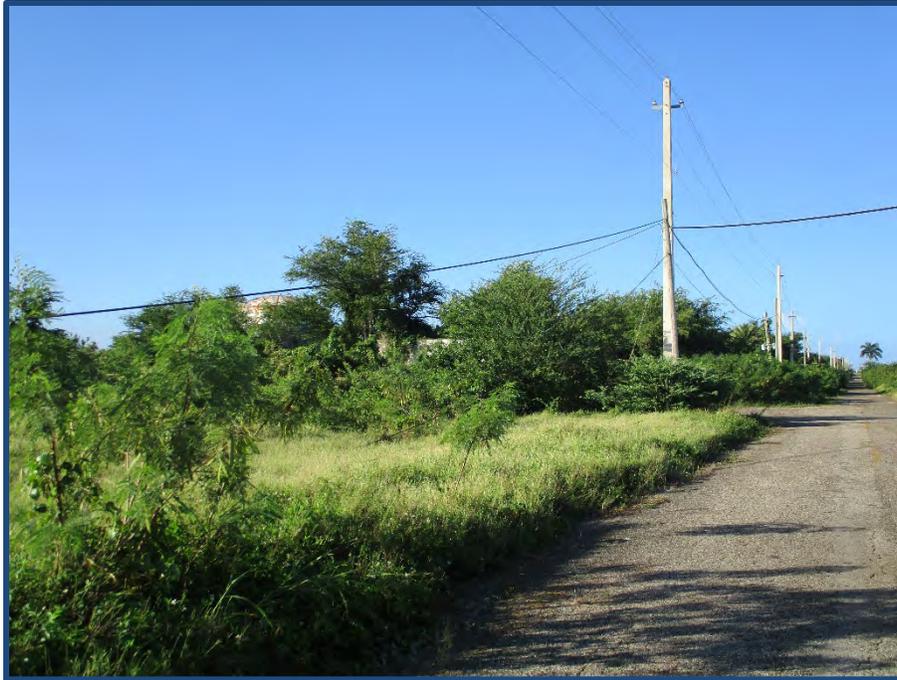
Overgrown locations with damaged utility risk, facing south.
